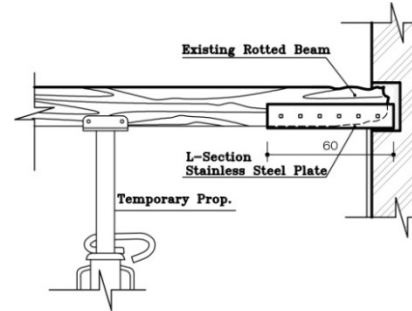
Showing galvanized L-Section plates inside the room (Hammoud J., 2022)
